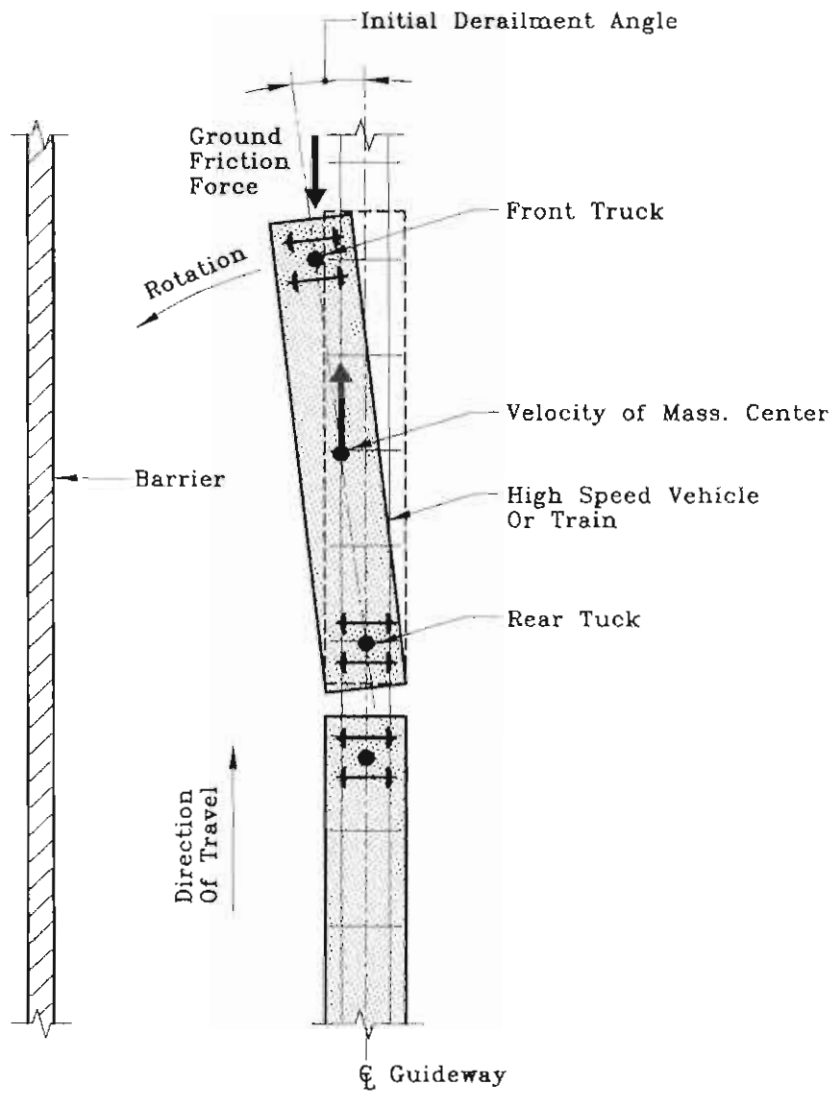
PLAN VIEW ILLUSTRATING INITIAL DERAILING ANGLE
